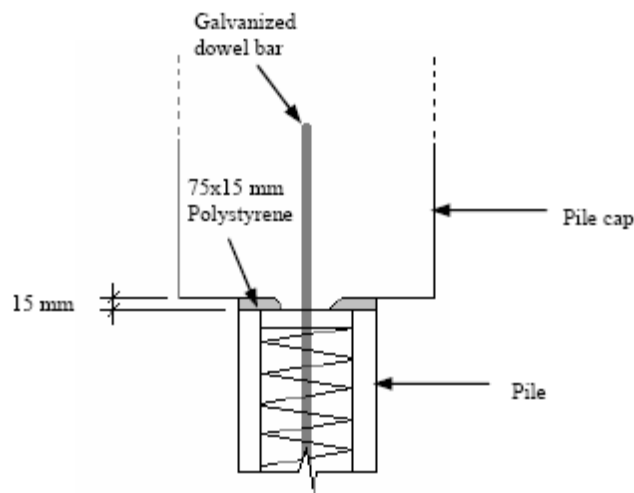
Illustration of the pin connection used in Gilles Street Bridge [18].
